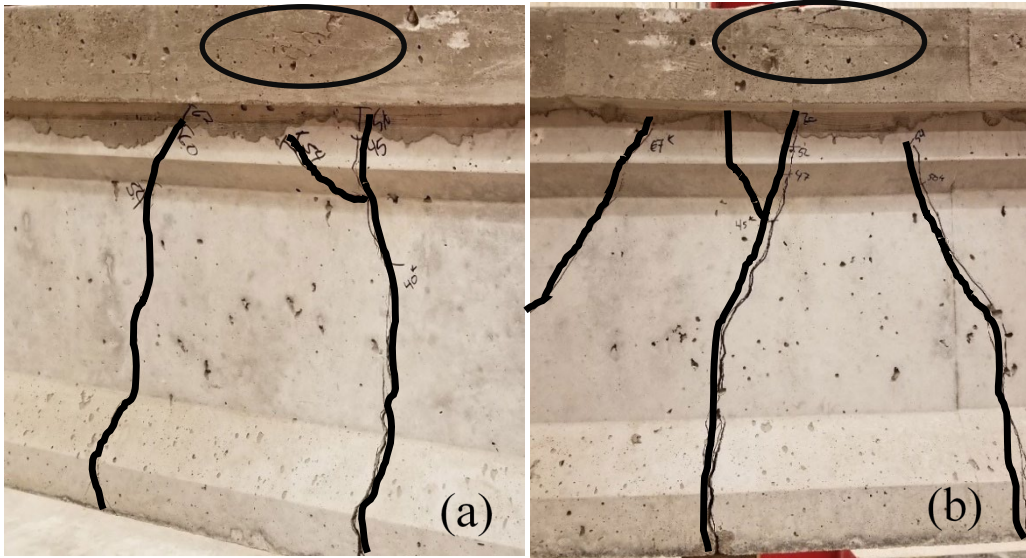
Crushed concrete deck in the NC2-N (a) and NC2-S (b) girders is indicated by a black oval, and the final flexural cracking under the load point in the girders are indicated by dark lines.
